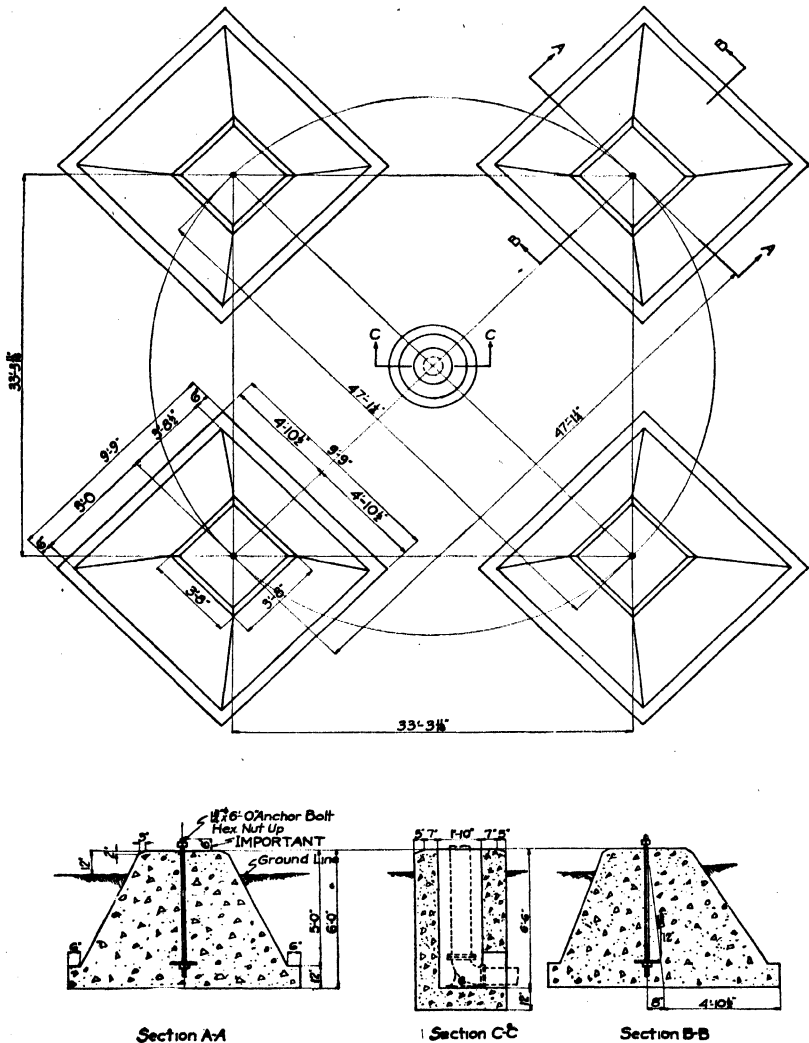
Foundation for 100,000-gal. tank, 100'-0" to bottom, concrete mixture 1:3:5.
